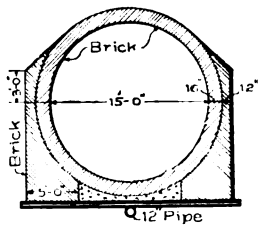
Circular Brick Sewer with Sub-drain, 64th Street, Brooklyn, N. Y.
